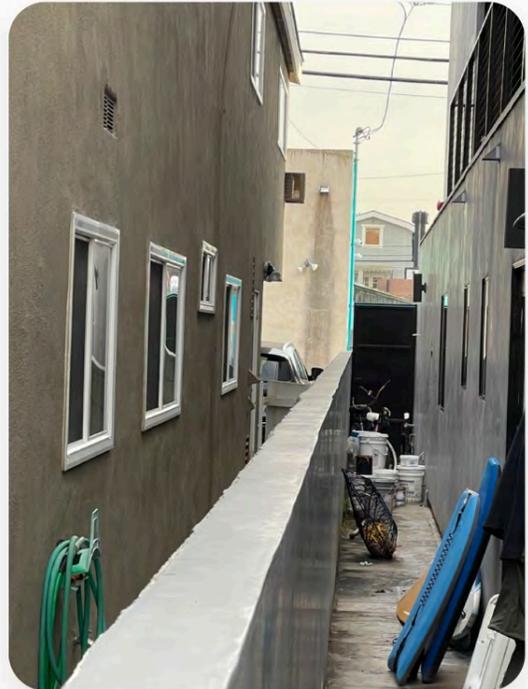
Exhibit E -- Photos of Garage set farther toward alley than any other house:
